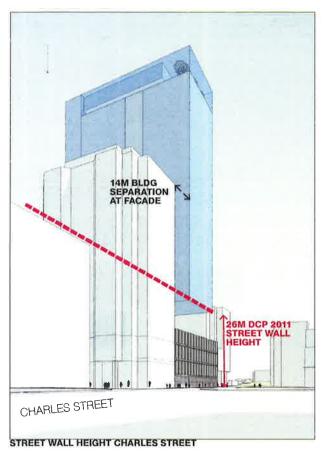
Street Frontage Heights and Upper Level Selbacks Charles Street
